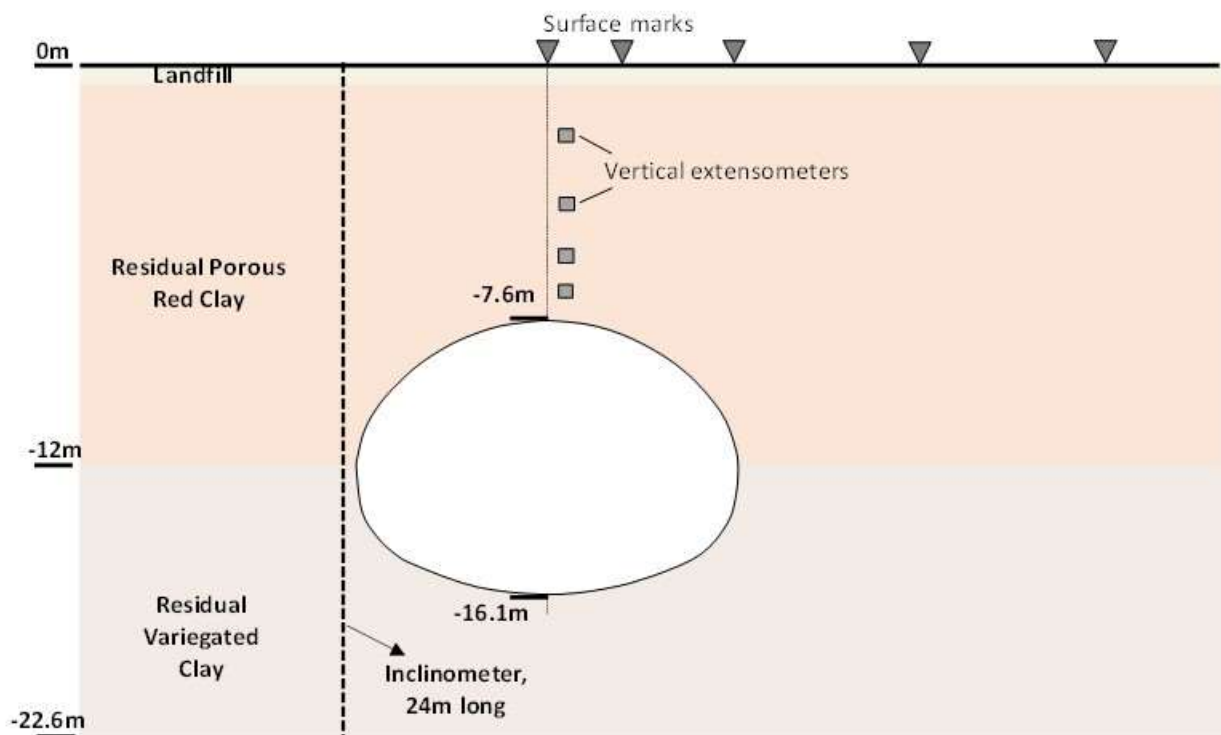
Geotechnical profile and tunnel instrumentation.
